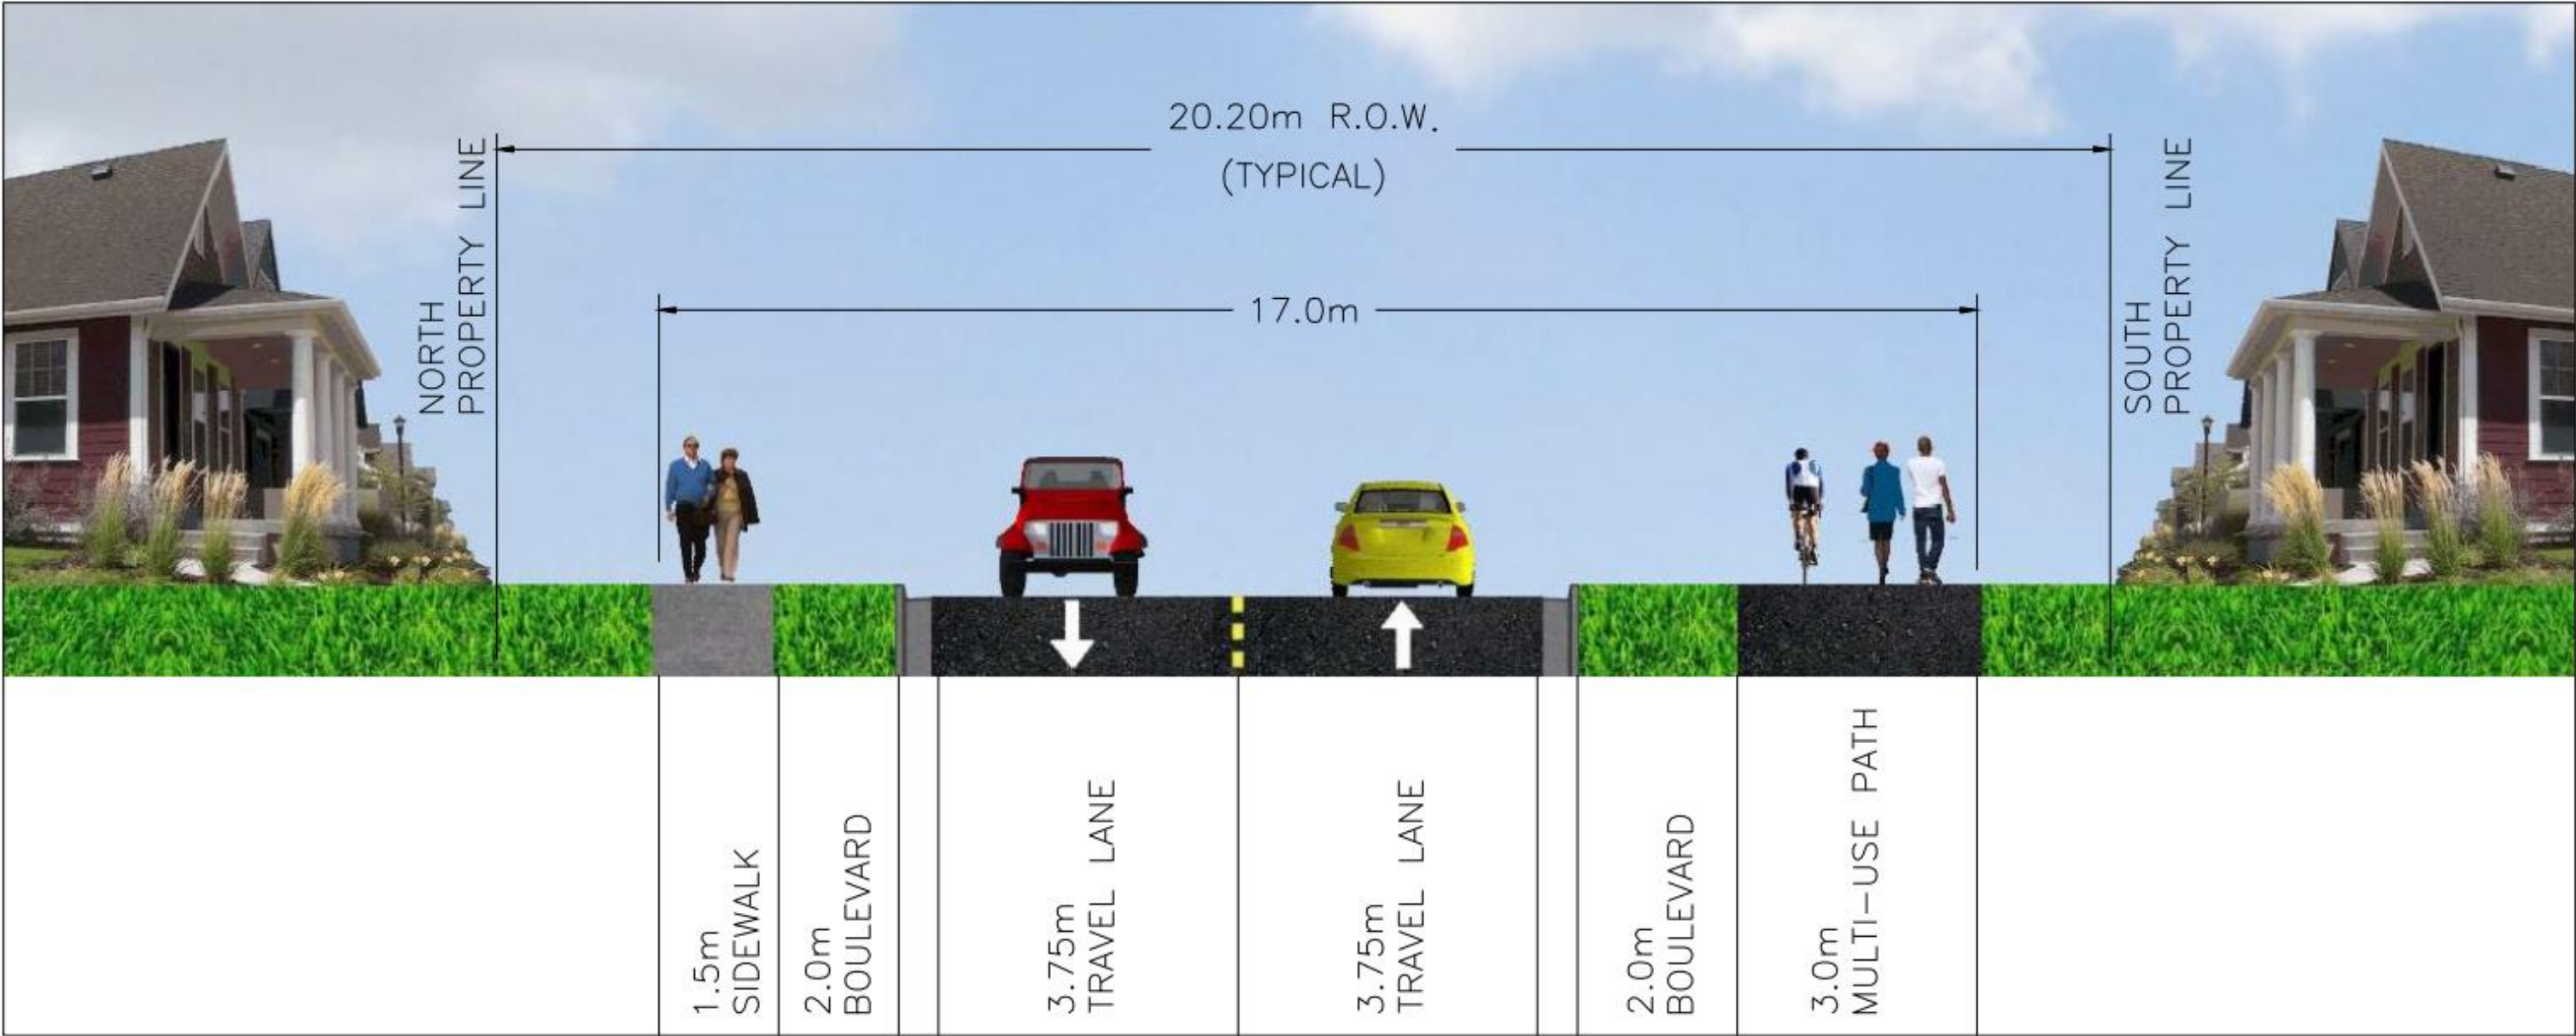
Typical Section (St. David's Road Preferred Solution)
